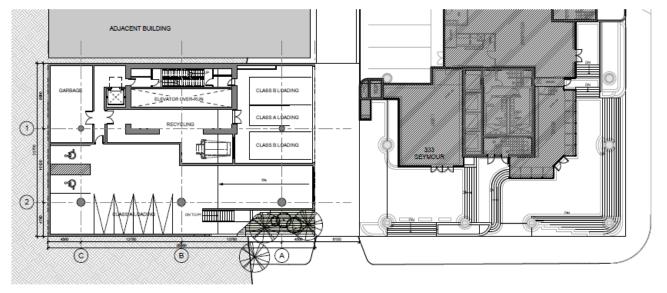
Level 0 Floor Plan including 333 Seymour Street
